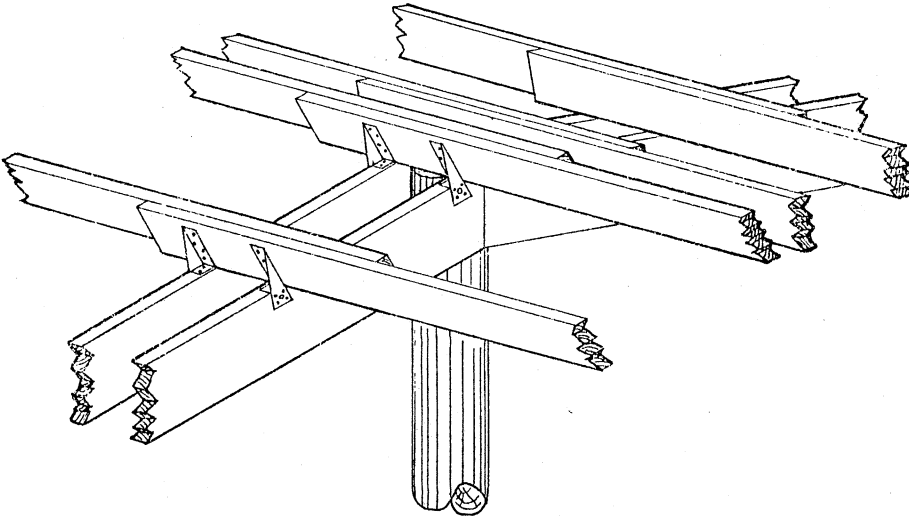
Two purlins are placed at the roof ridge with lower sides touching to provide nailing surface for end of roofing sheets and for ridge roll. A solid deck roof can be nailed to the purlins if non-rigid roofing material is to be used.
